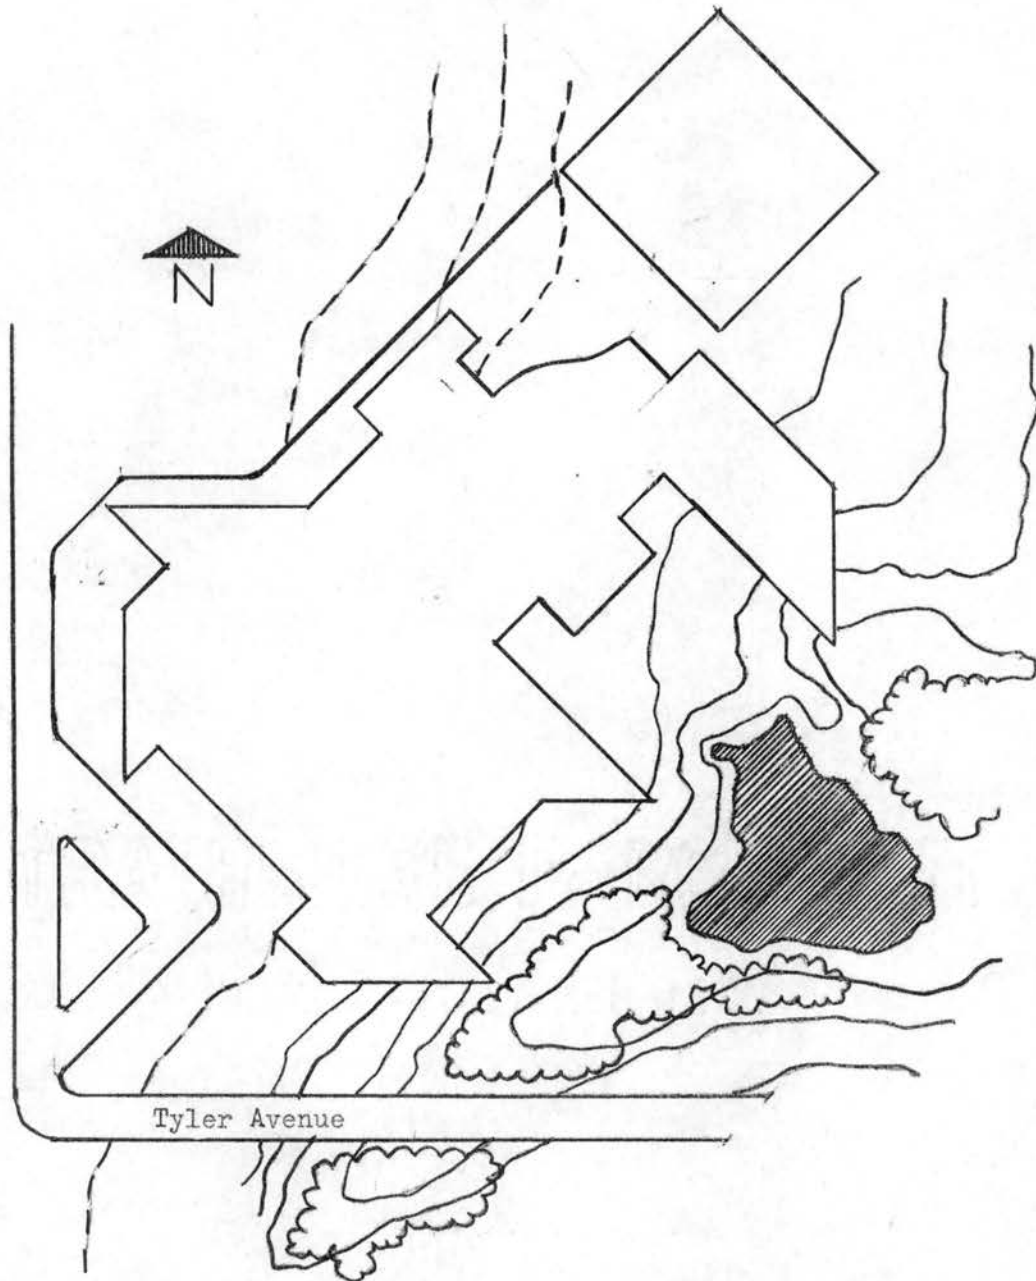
Site Plan - Scale $\frac{1}{64}''/1'-0''$
